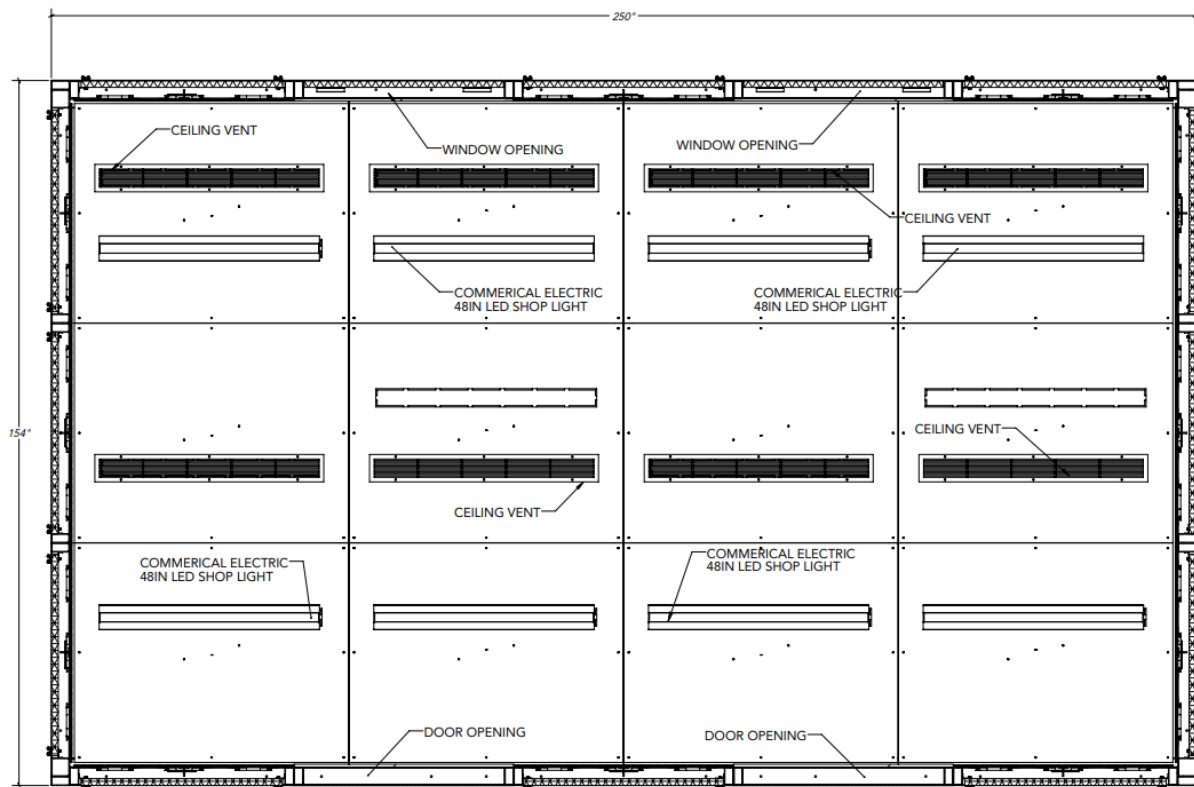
HBIL - ceiling view with electrical and air diffuser slots
